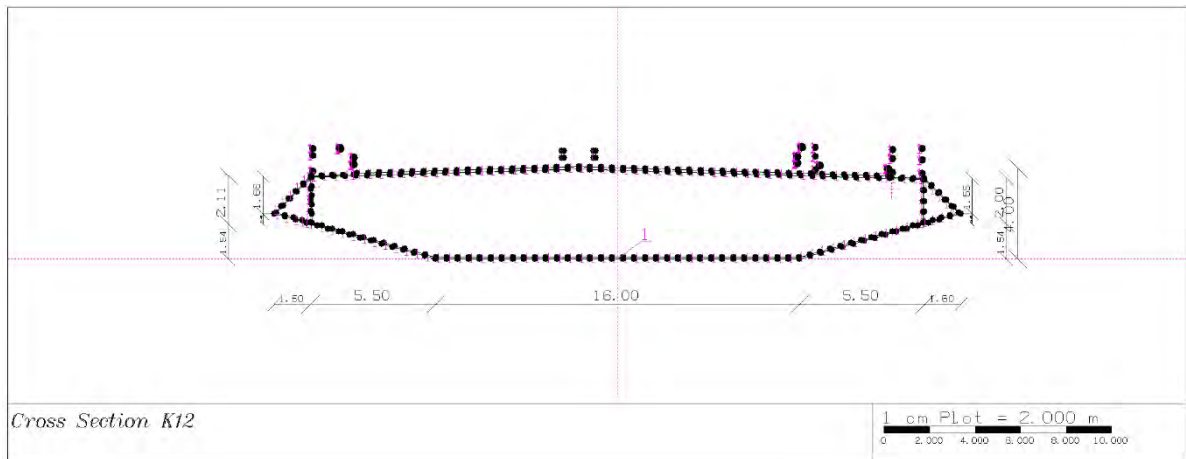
Finite element model of K12 cross section, used as final design cross section.
